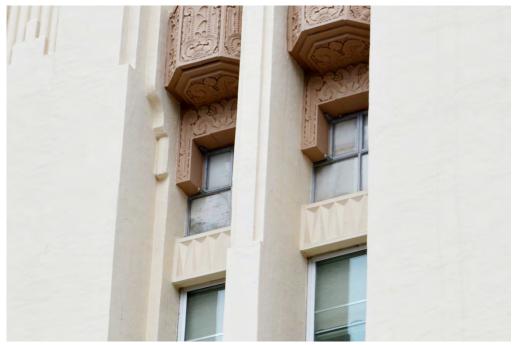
Detail of windows at the tower on Building 1, showing original steel frame windows above newer, non-historic aluminum frame windows (photo by HHM, 2014).
